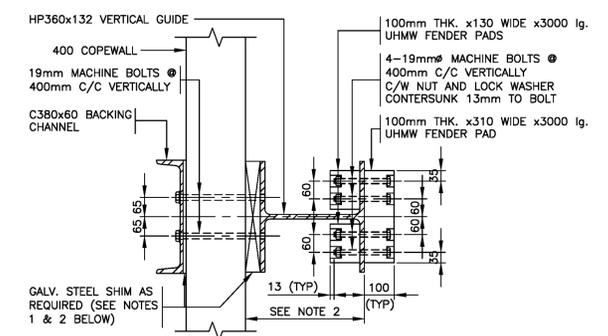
DETAIL @ FIXED & ADJUSTABLE ARMS (TYP)
